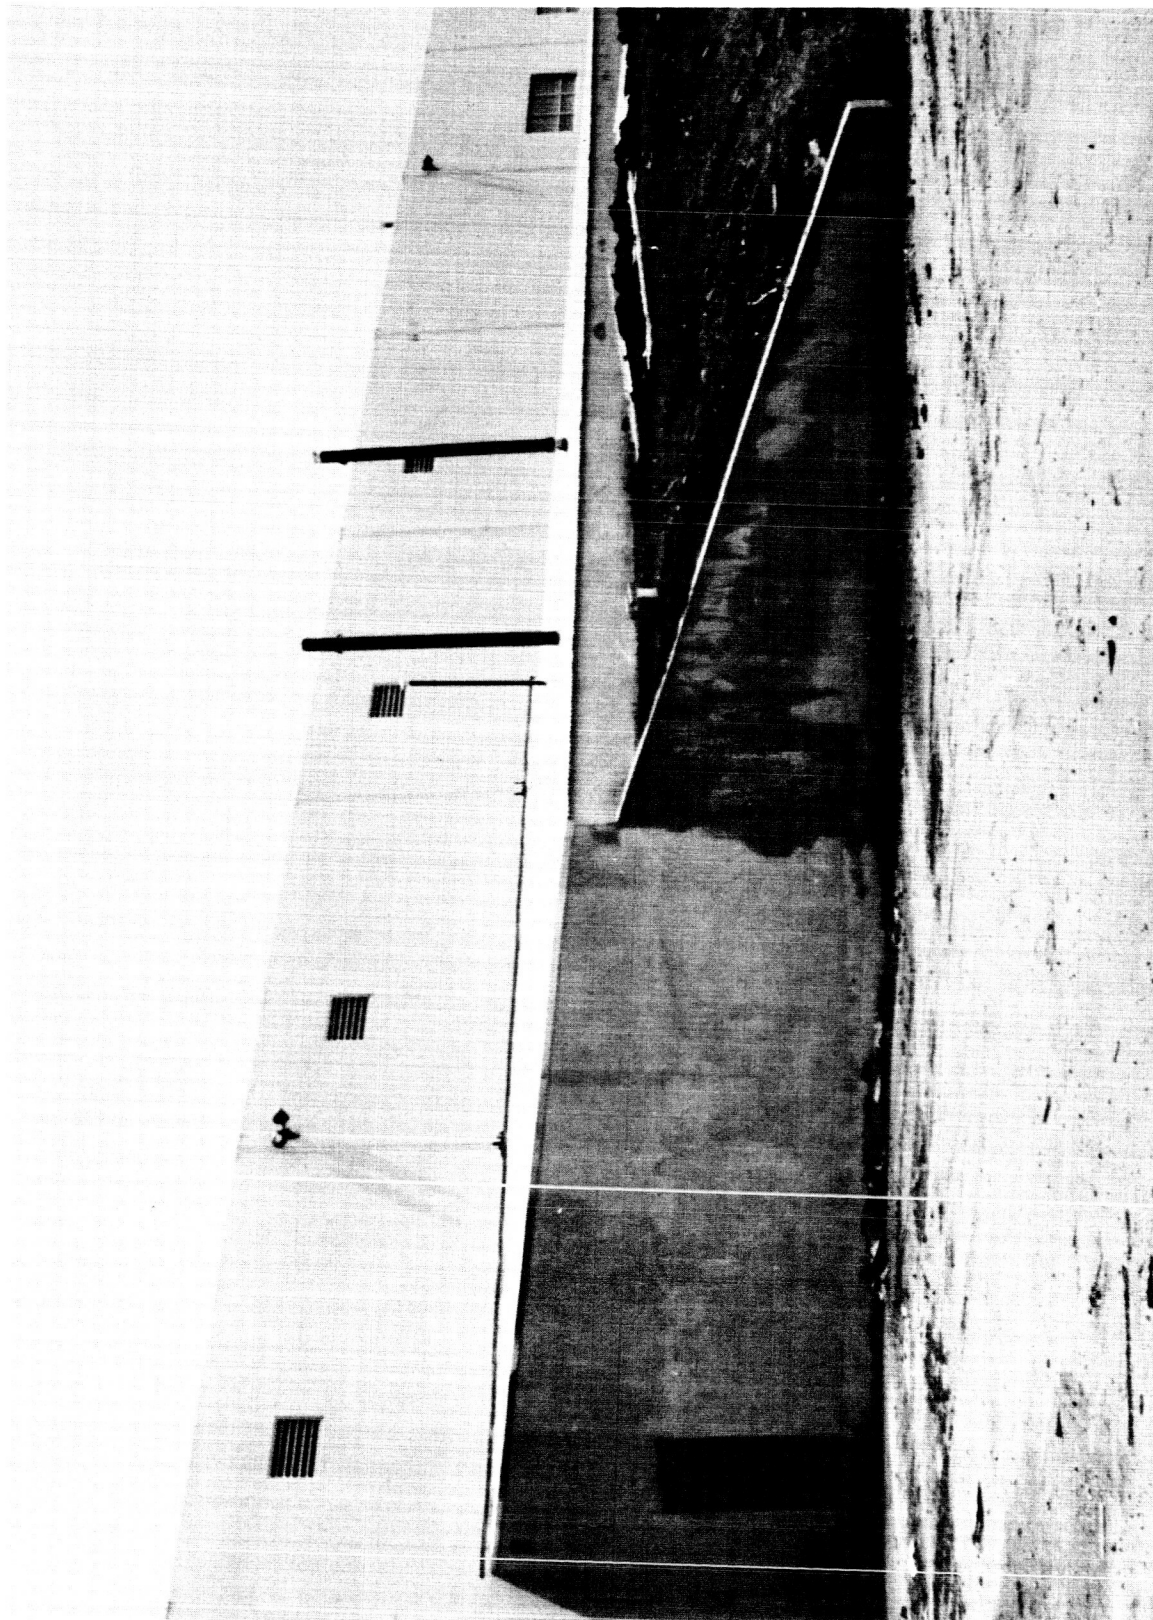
EXTERIOR VIEW OF THE HIGH EXPLOSIVES CONTAINMENT FACILITY
